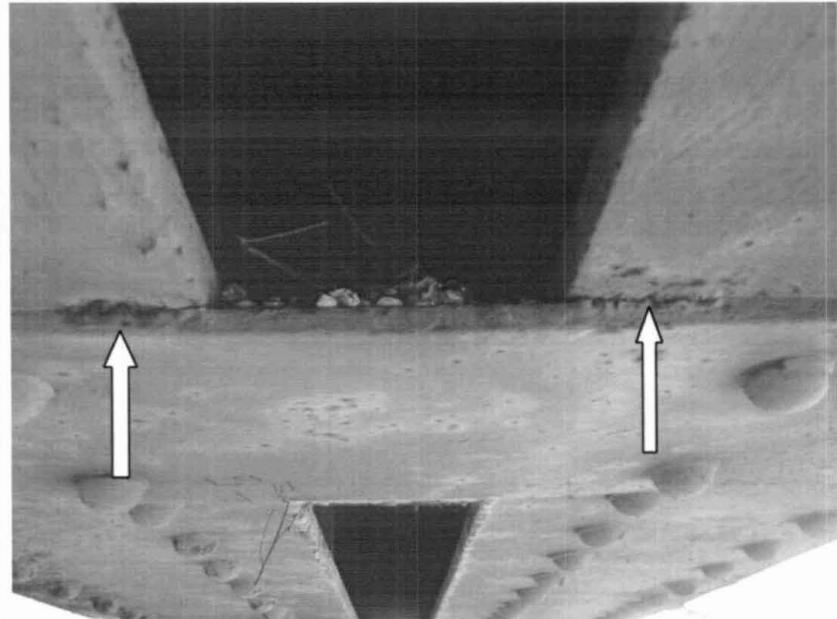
Typical cracked/broken tack welds between the batten plates and bottom flange cover plate of steel pier cap (pier 1).
